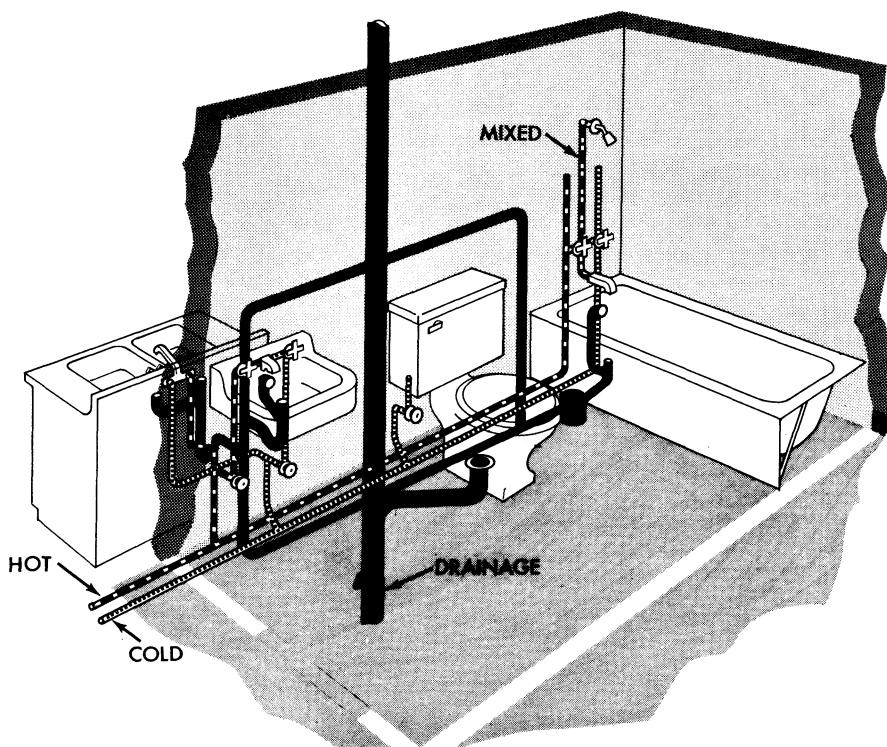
Plumbing fixtures located back to back on opposite sides of a wall.
